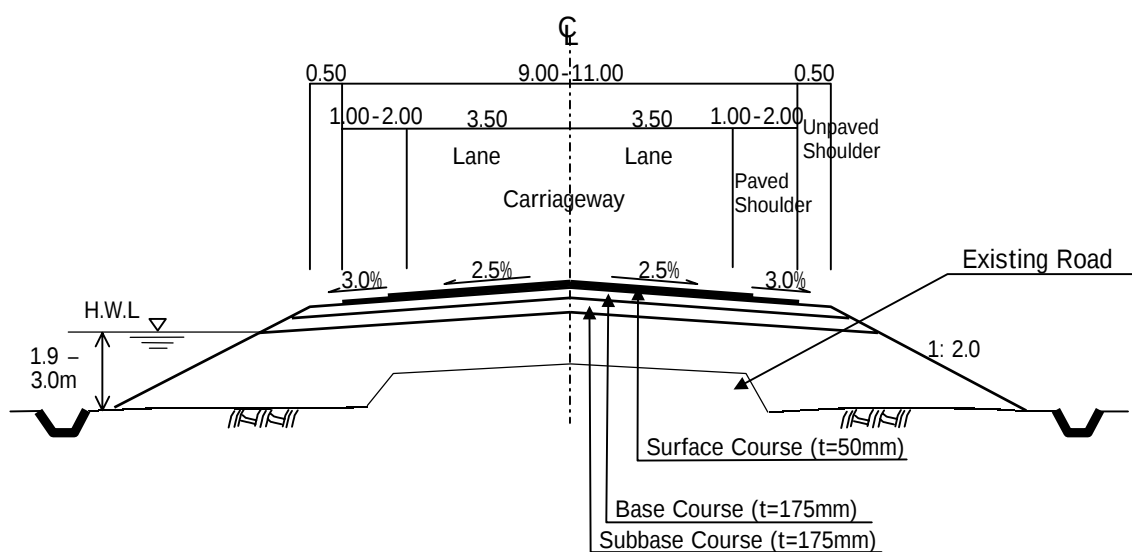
Typical Cross Section for Alternative 3 (L = 4.05km)
